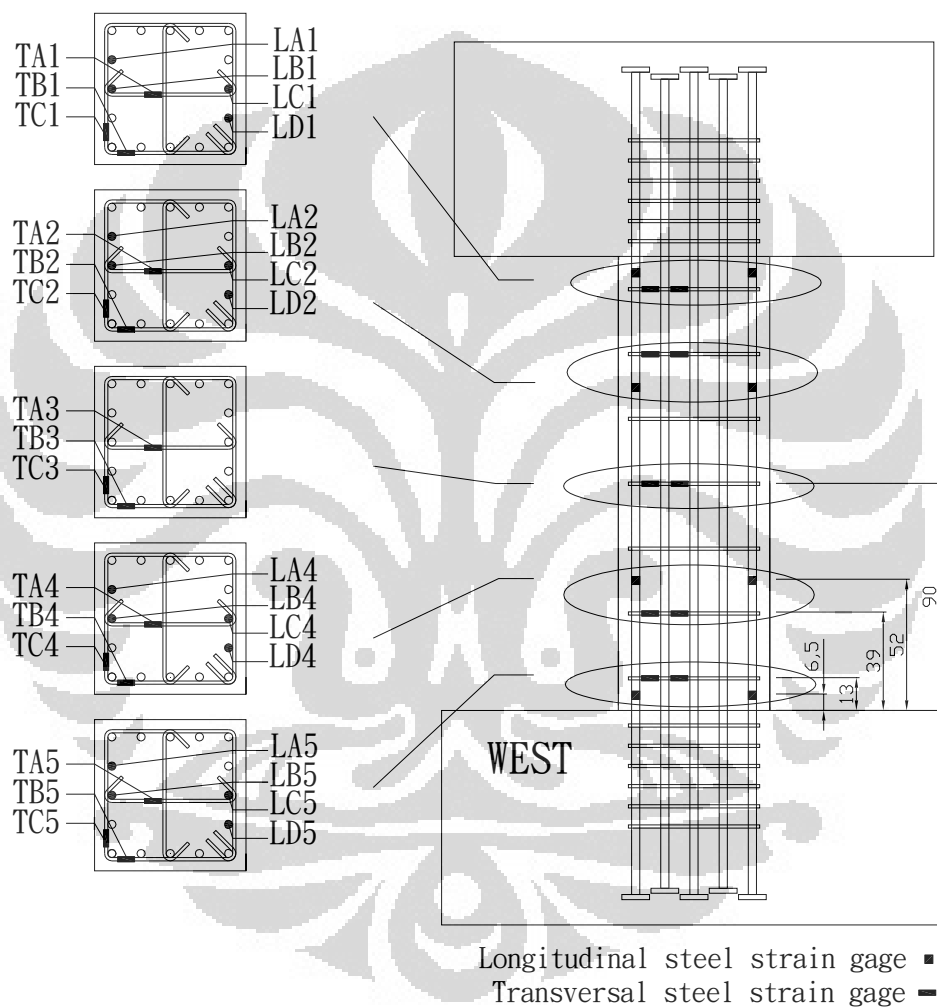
Arrangement and numbering of strain gauges on the transverse and longitudinal bars for specimens with 260 mm of transverse reinforcement spacing
